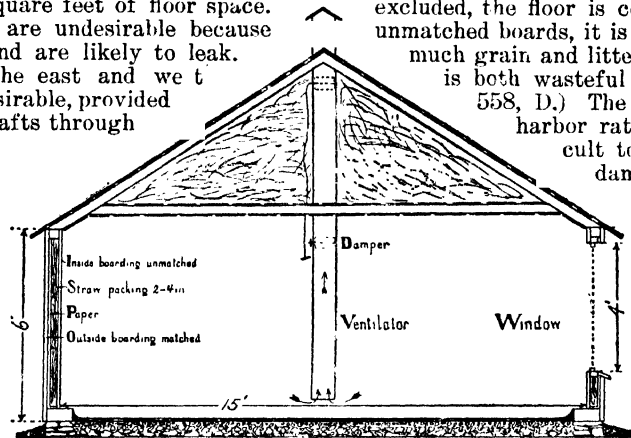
Cross-section of house. Note wall construction, ventilating device, and gable stuffed with straw.
